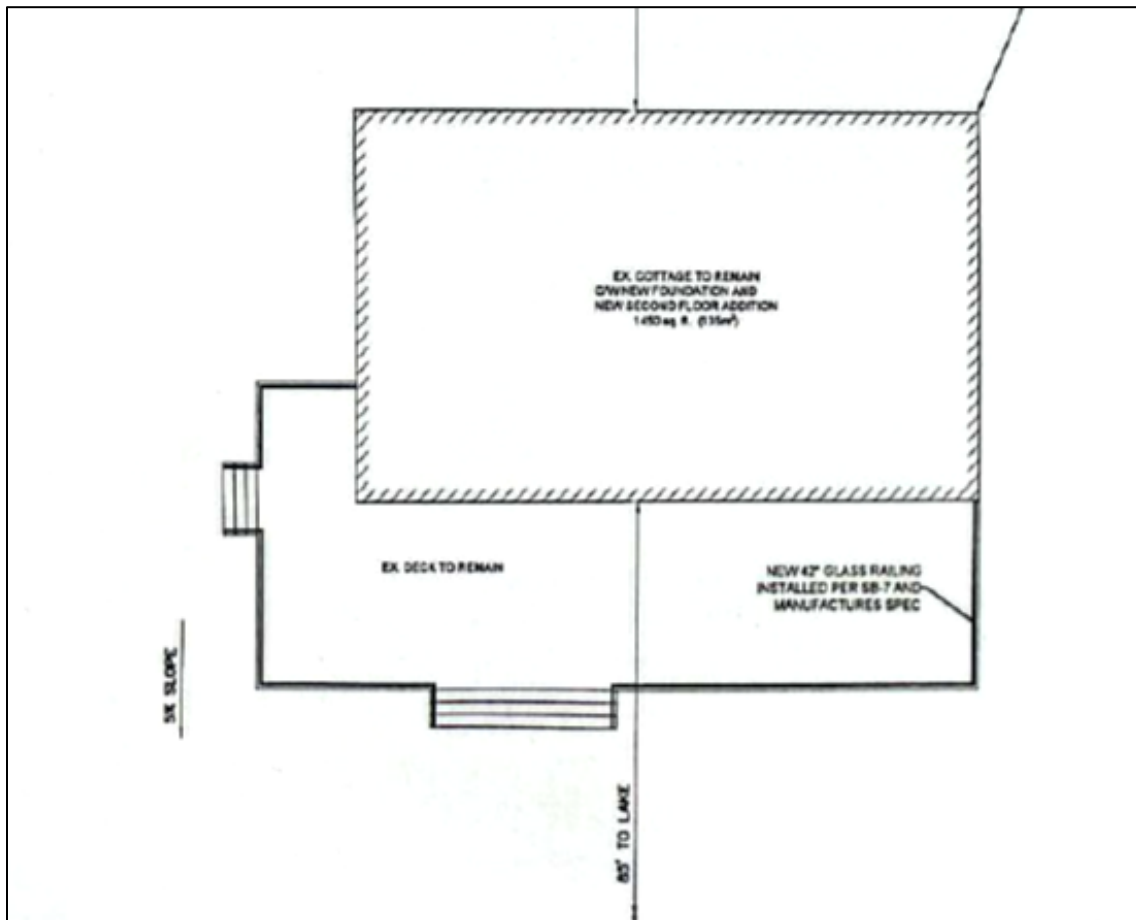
Portion of the plans submitted with the application, showing the proposed enlarged dwelling and deck final configuration.
